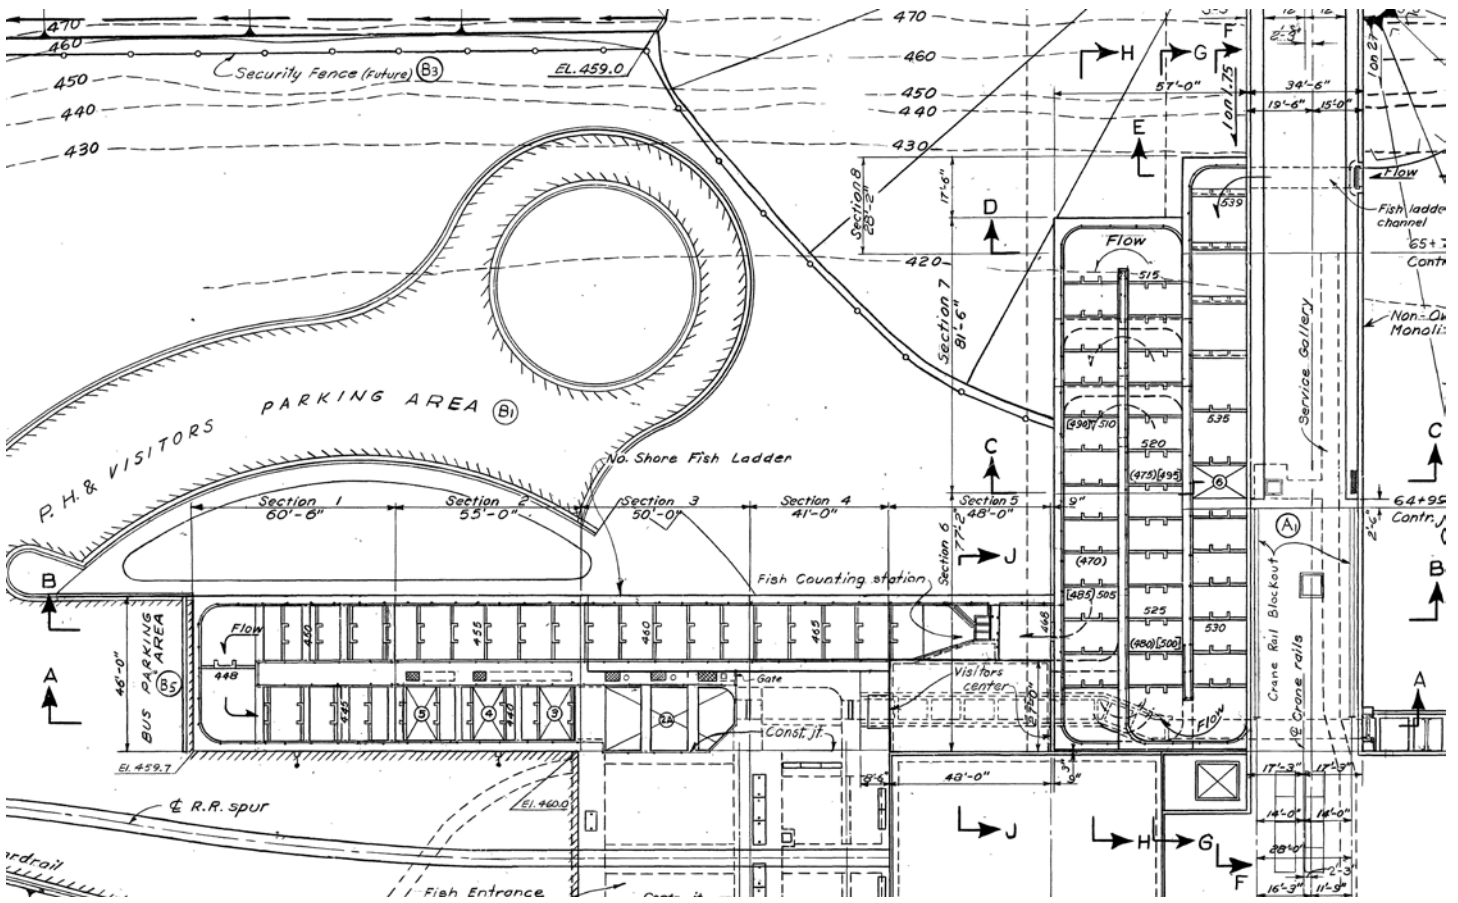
Lower Monumental North Shore Fish Ladder Plan
